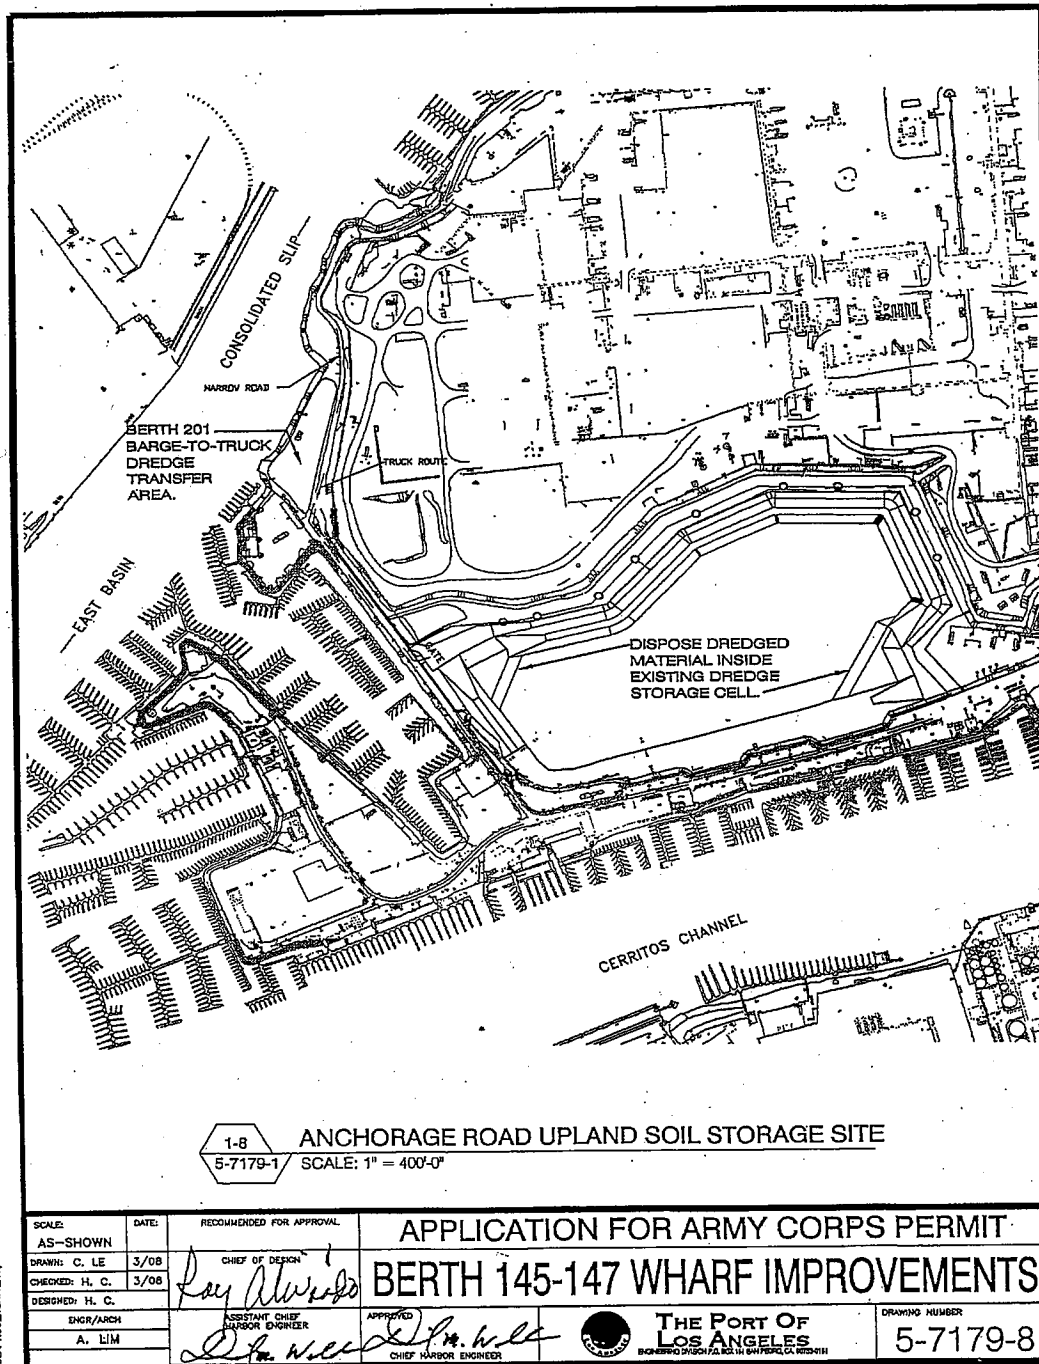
Location of Anchorage Road Soil Storage Site in Los Angeles Harbor.
